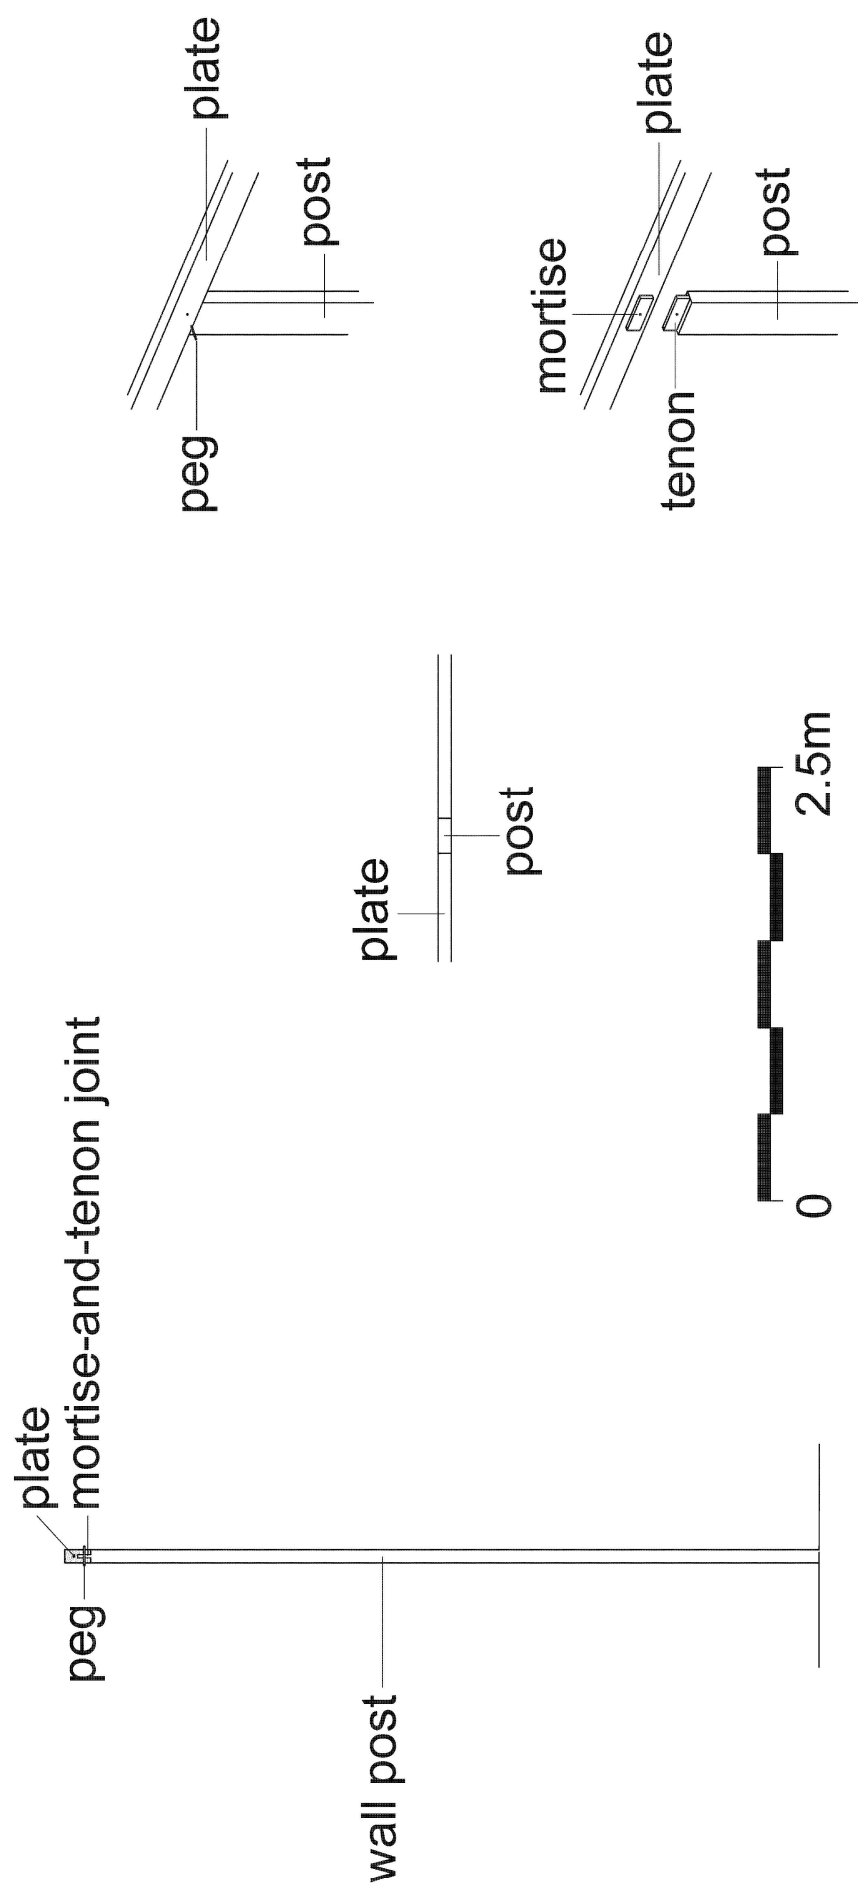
1. Reconstruction of the sitting of the plate above a wall post using mortise-and-tenon joint.
